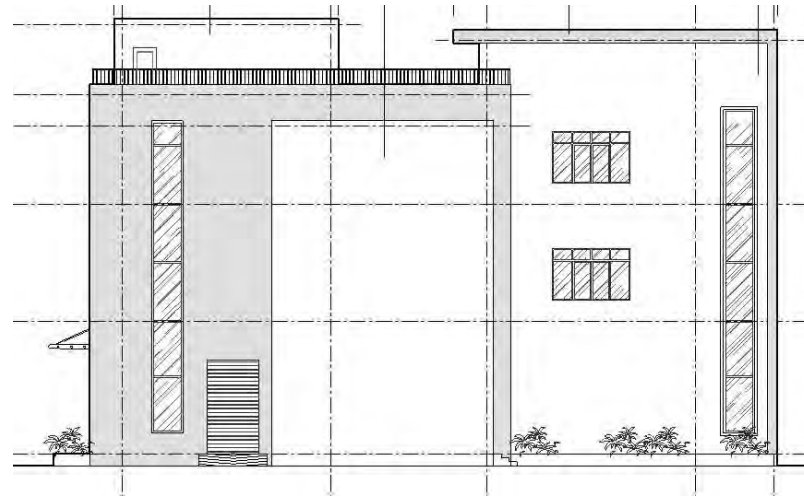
West Face of Administrative Building Elevation Plan
